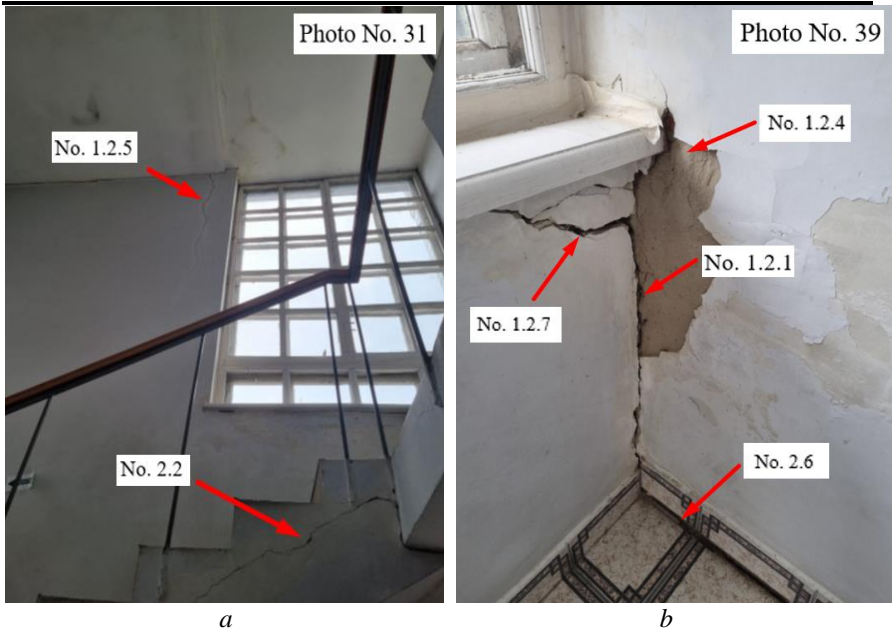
Cracks along the stringer (a), subsidence of the stair landing (b)
